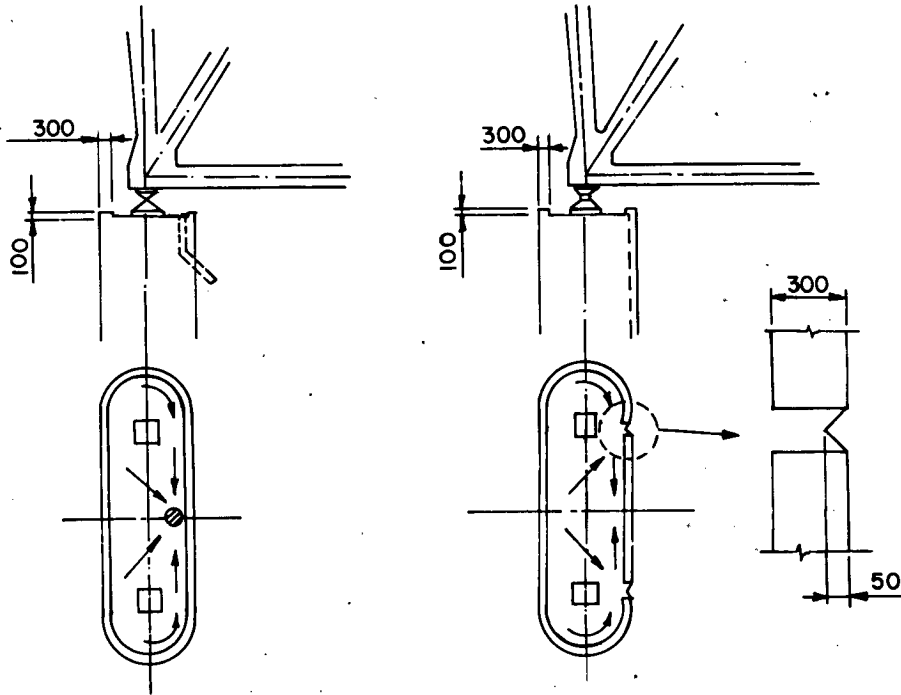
Sloping pier caps with a 4-in. (100-mm) high parapet wall. [Yamada 1983]
